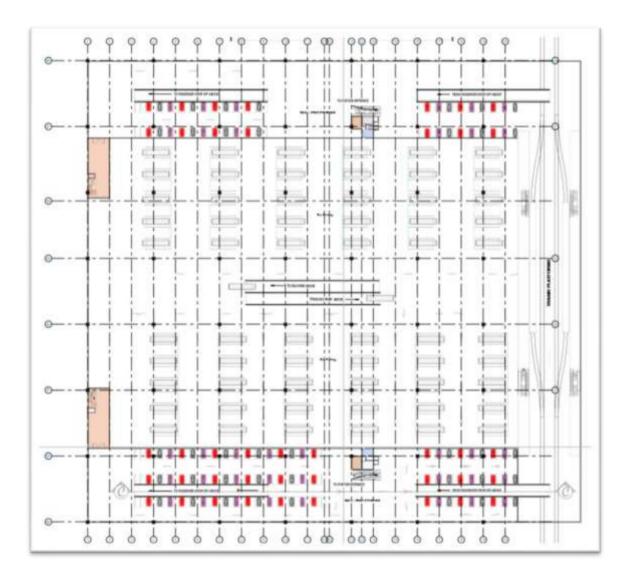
Proposed basement floor plan Source: Researcher's design proposal, (2020)
